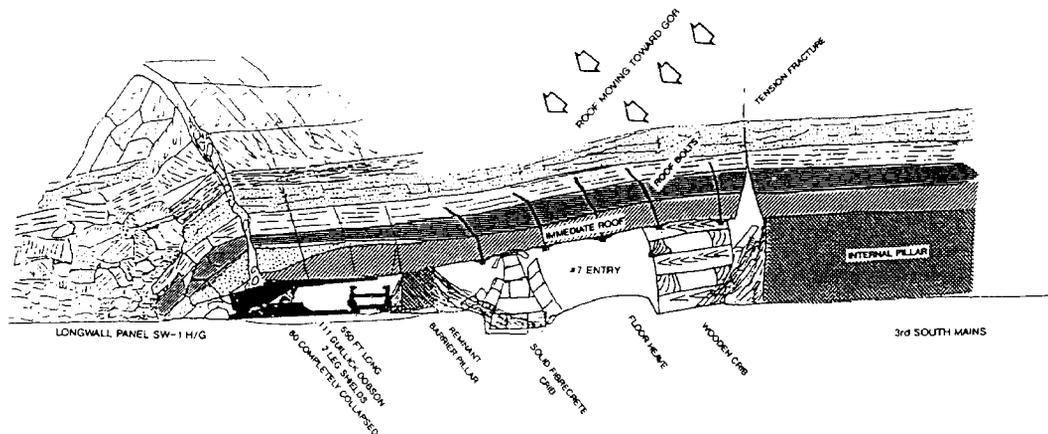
, Typical physical behavior of a pre-driven room under weighting type roof failure. From underground observation of the Colorado recovery room failure. Note the fracture observed to develop at the front edge of the abutment pillar. (From Pulse, 1990)
